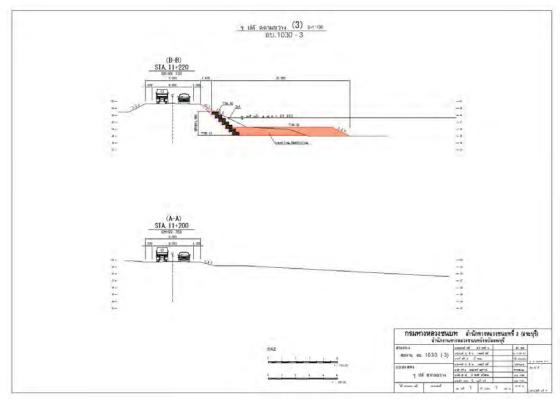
Design drawing of rehabilitation plan (Bridge 1030-3)
